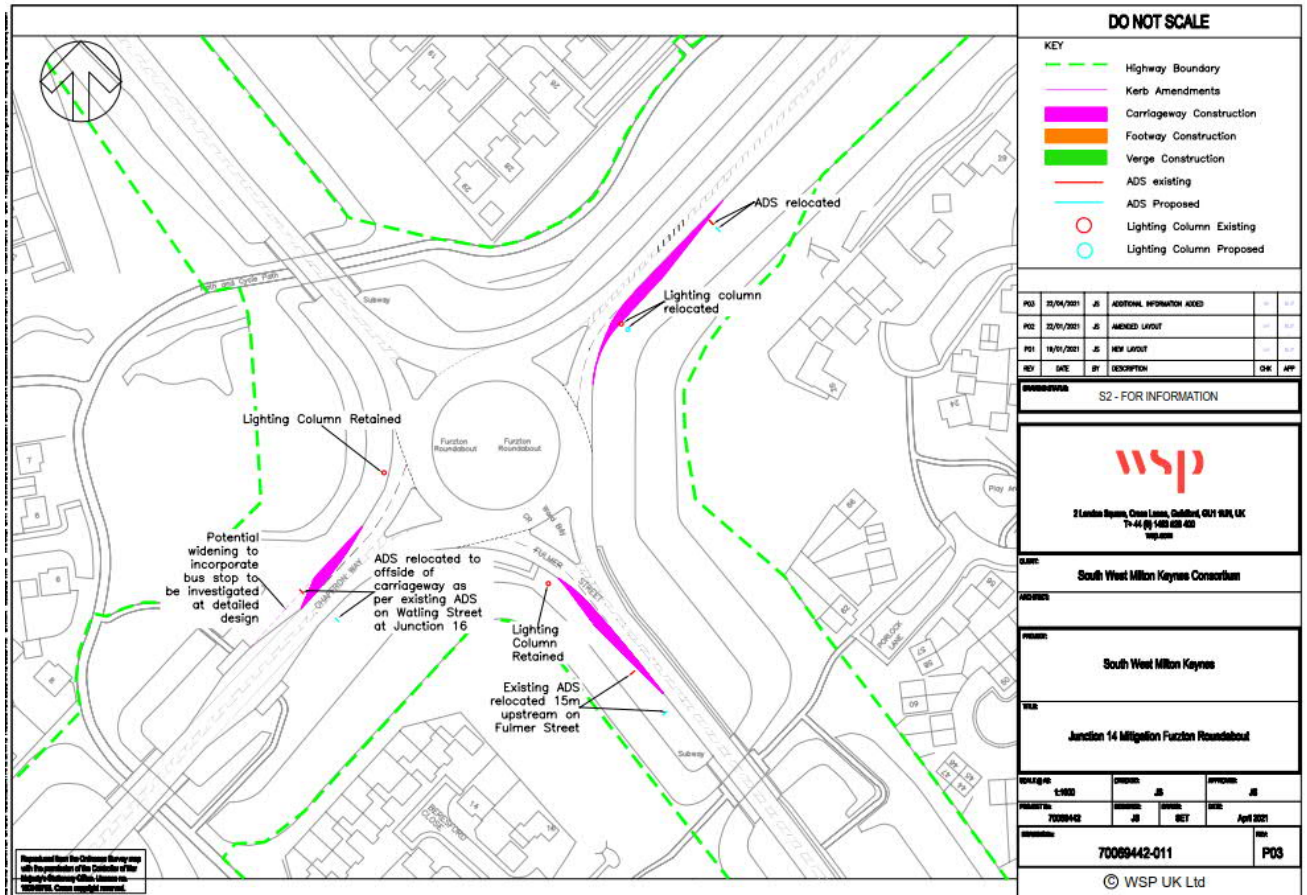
Junction 14: Furzton Roundabout Mitigation Layout
